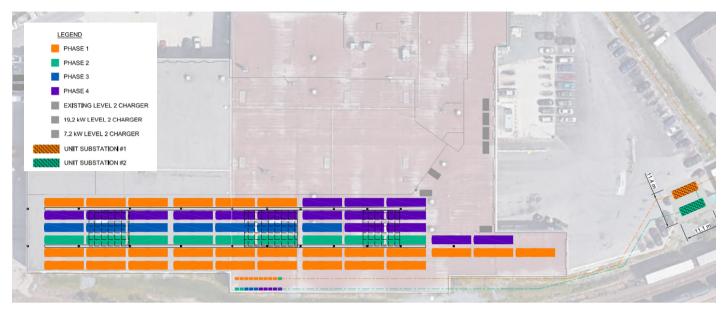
Greater Sudbury Transit & Fleet Centre Conceptual Site Plan
